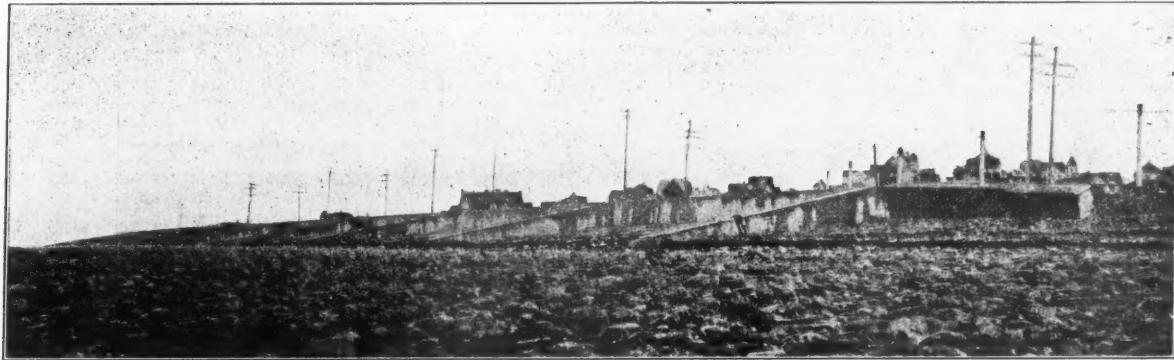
General View of Sea Wall and Wing Walls at Hull, Mass.
